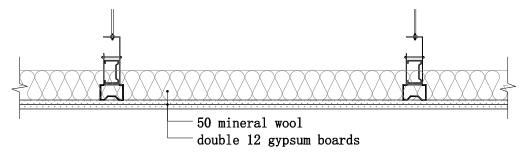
non-rigid suspending ceiling construction used in Yinlu
